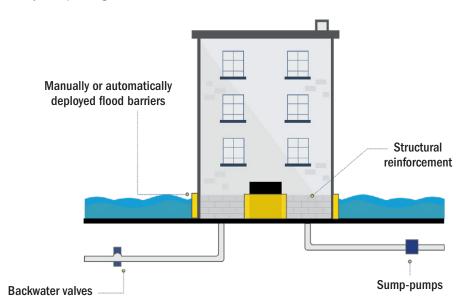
Principle of dry floodproofing: Structural Reinforcement
